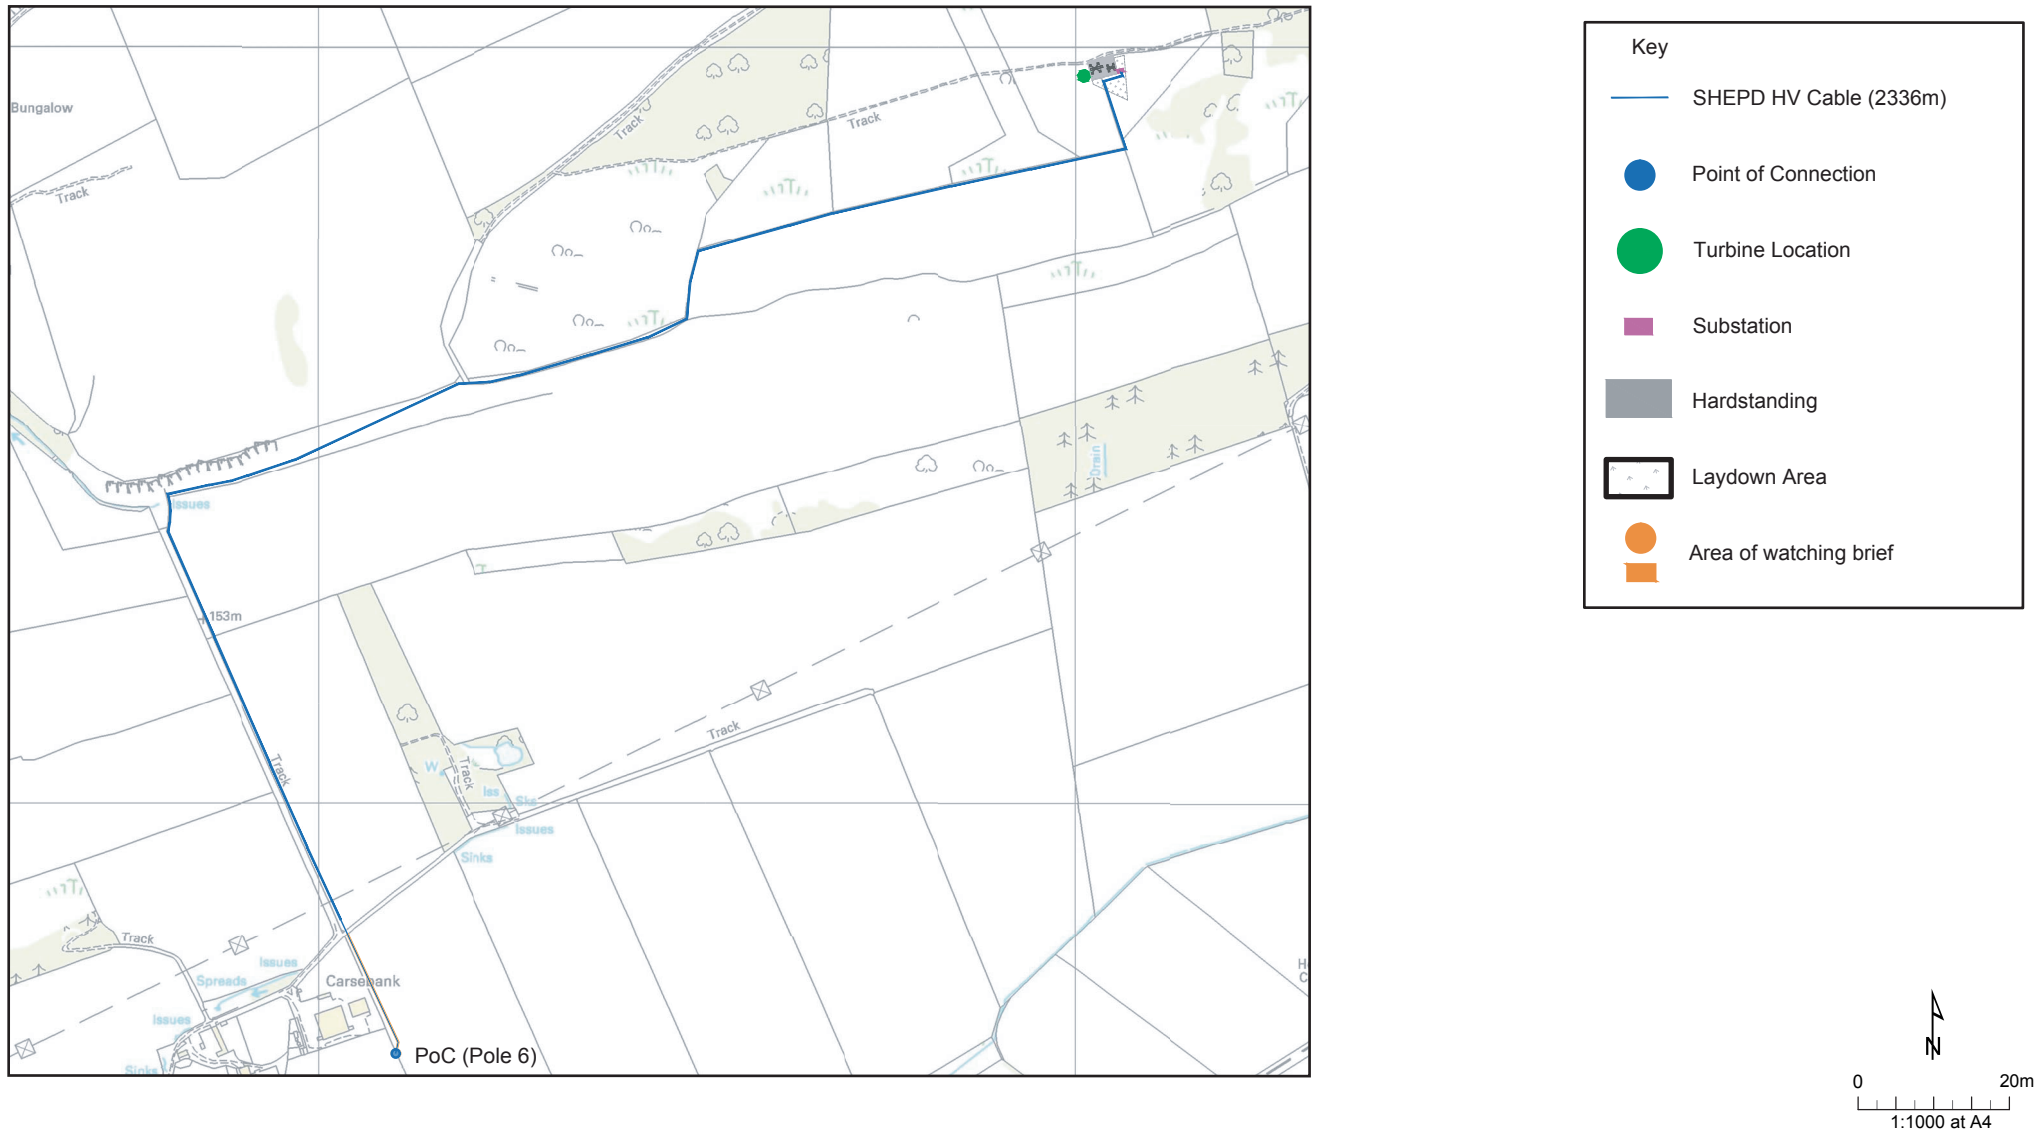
Site plan showing the cable route and the area subject to the archaeological watching brief (base site plan provided by Kilmac Energy Ltd)
